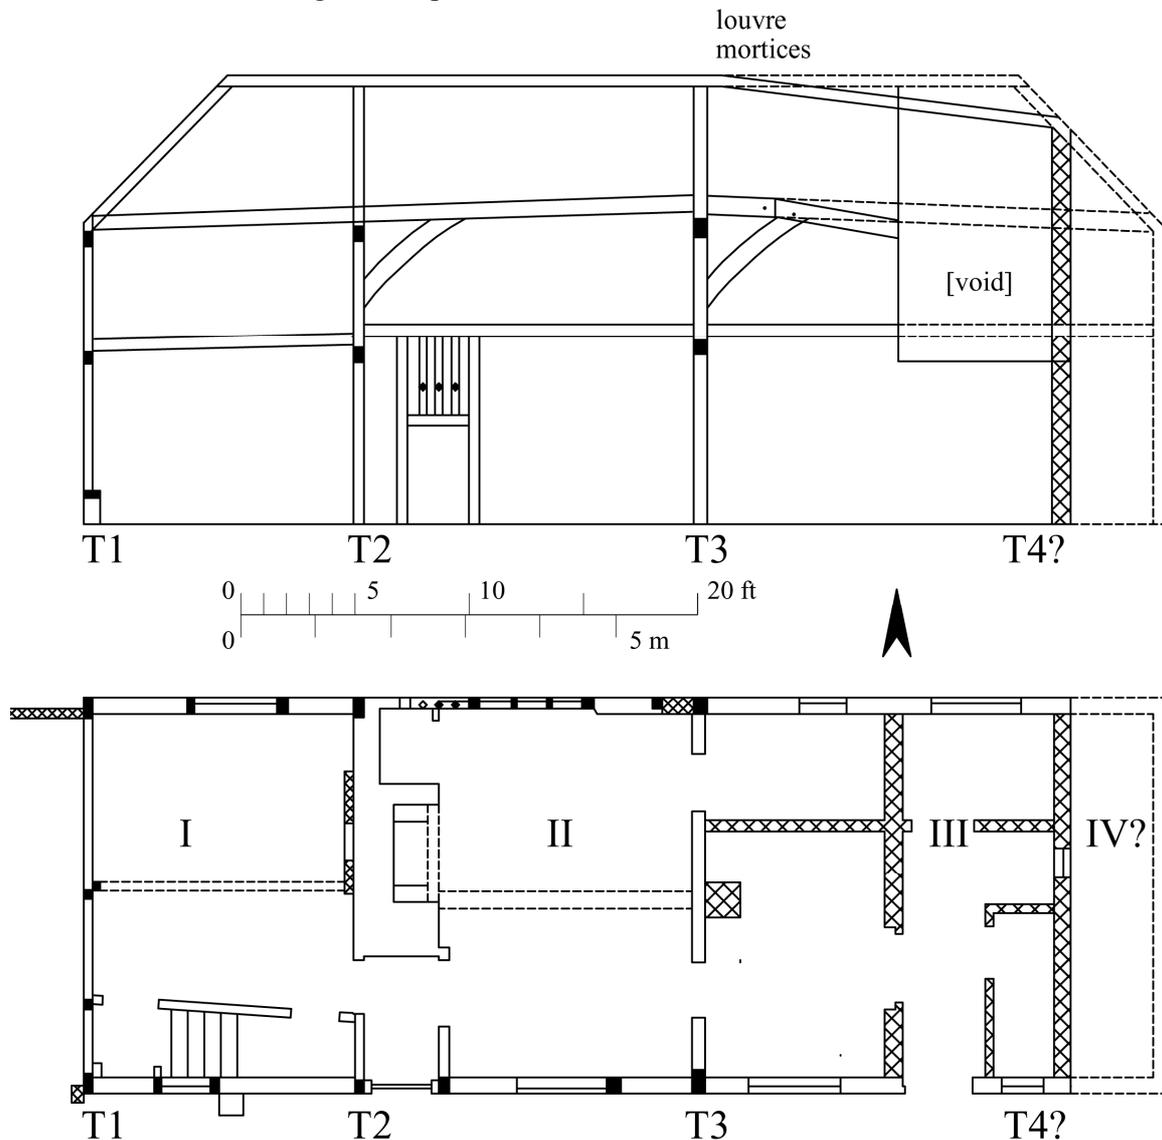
Plan, showing truss and bay numbering, and long section (omitting most post-medieval features).
